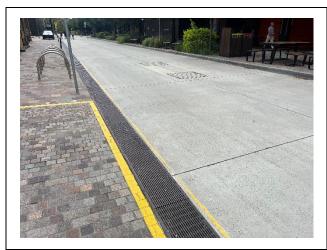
Locomotive Street, on road adjacent Bay 10, Unknown Pit x 2
